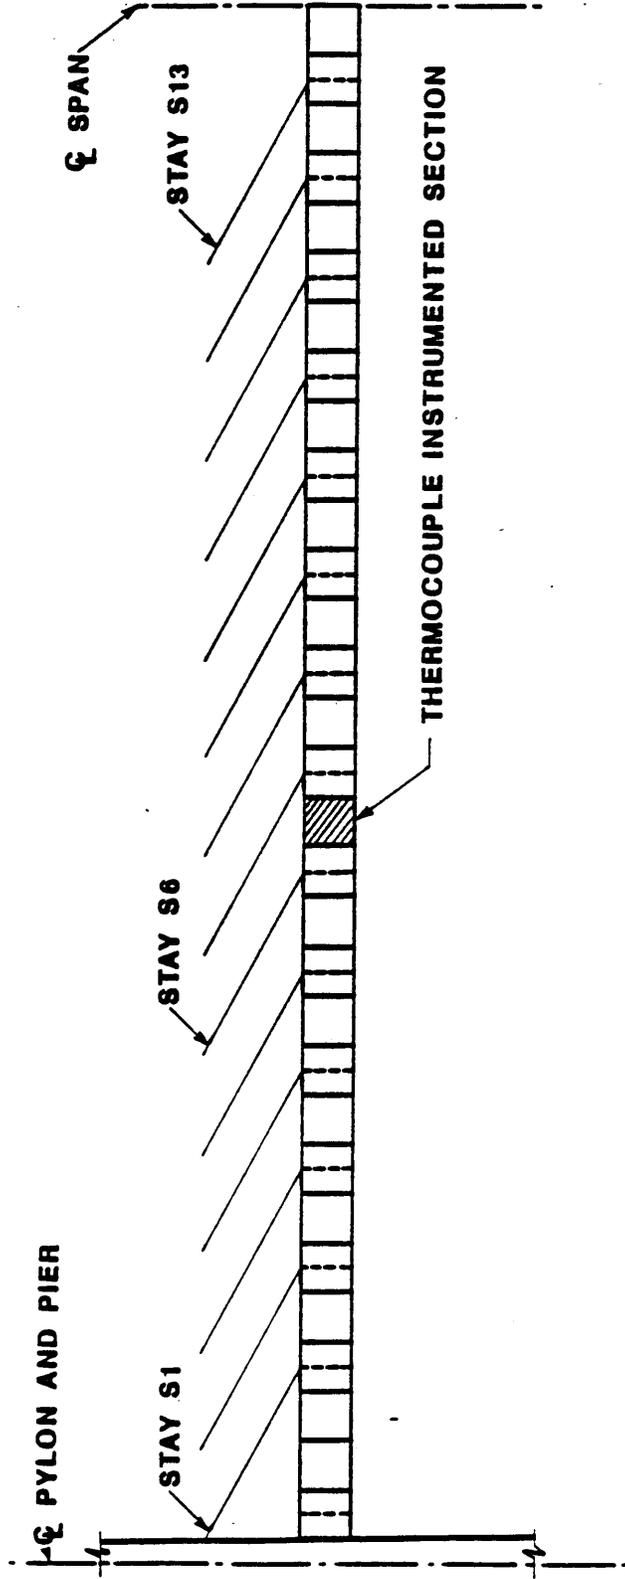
(b) Girder section for thermocouple instrumentation (south cantilever).
